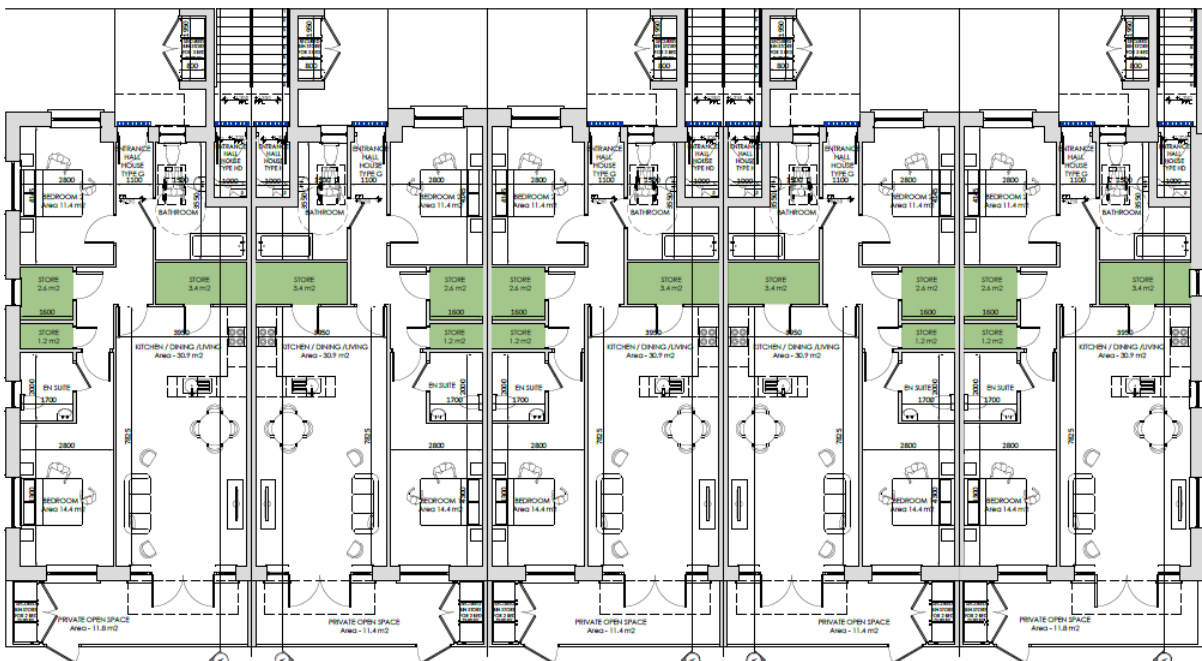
Proposed ground floor plan of Duplex Apartment Block B.
